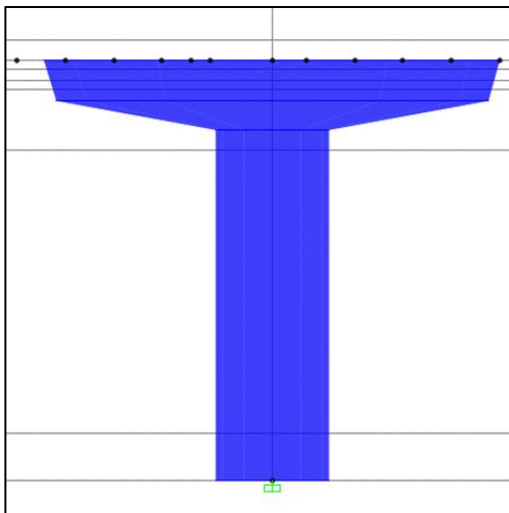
CROSS SECTION OF COLUMN WITH PIER CAP FROM INITIAL MODEL
